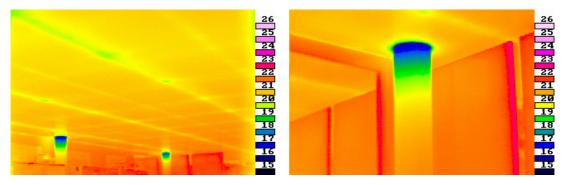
Concrete pillars passing from the roomside through the VIP-layer to the outside concrete roof slab. Pictures with the IR-Camera
